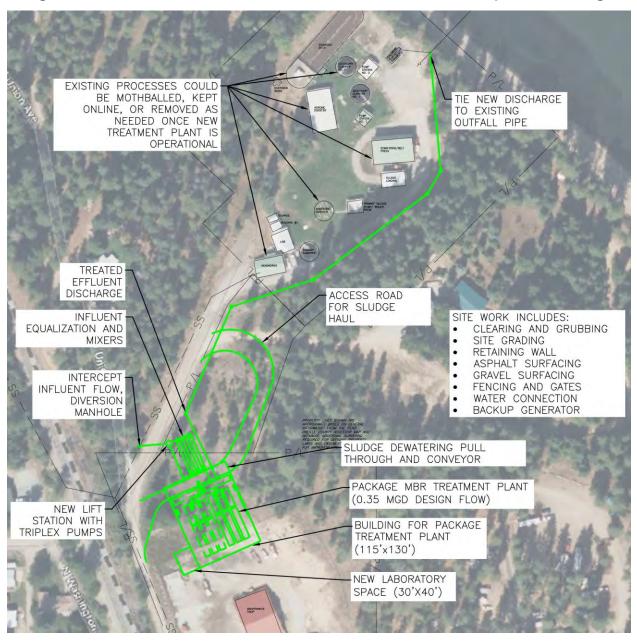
Alternative E Overview with MBR Plant and New Pipe to Discharge
